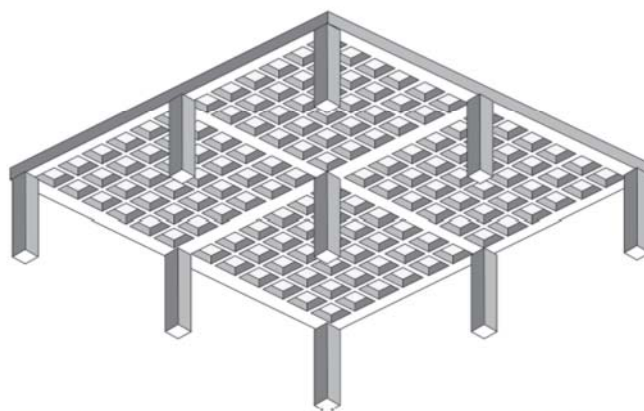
Two-way joist system or waffle-slab-on-beams system.
